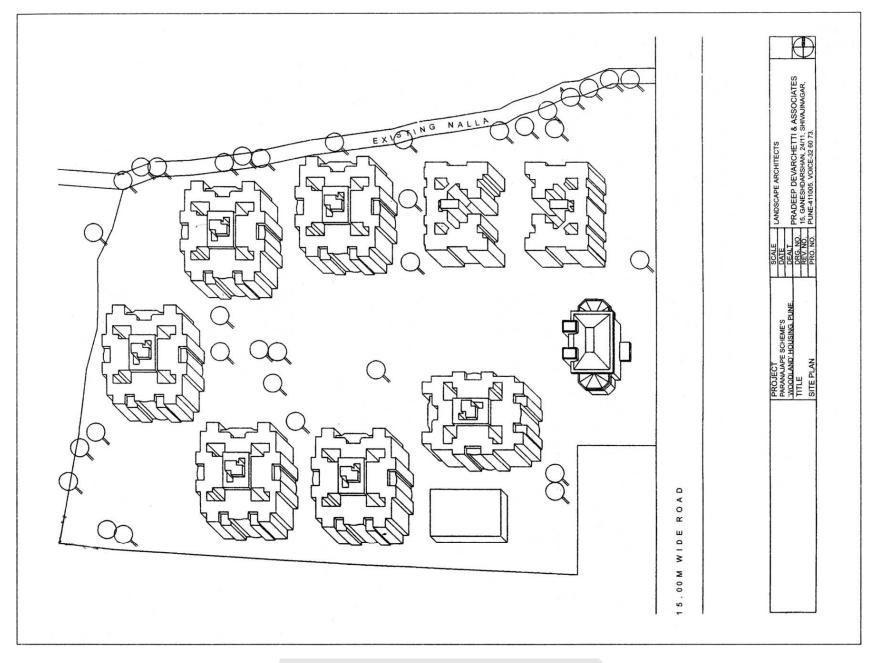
Site Plan before Landscape – Woodland Housing, Pune
